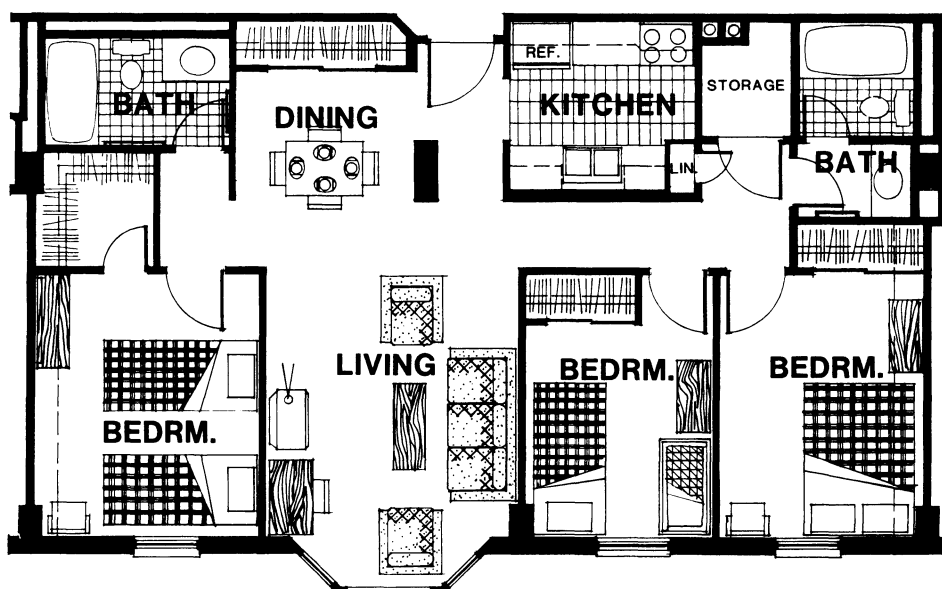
Typical three-bedroom apartment plan of Decatur Place, Denver, Colorado (Courtesy of Warren Village staff).
